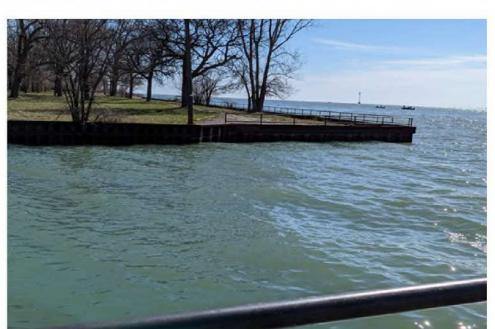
TREES BEHIND WALLS HAVE DAMAGED WALLS
